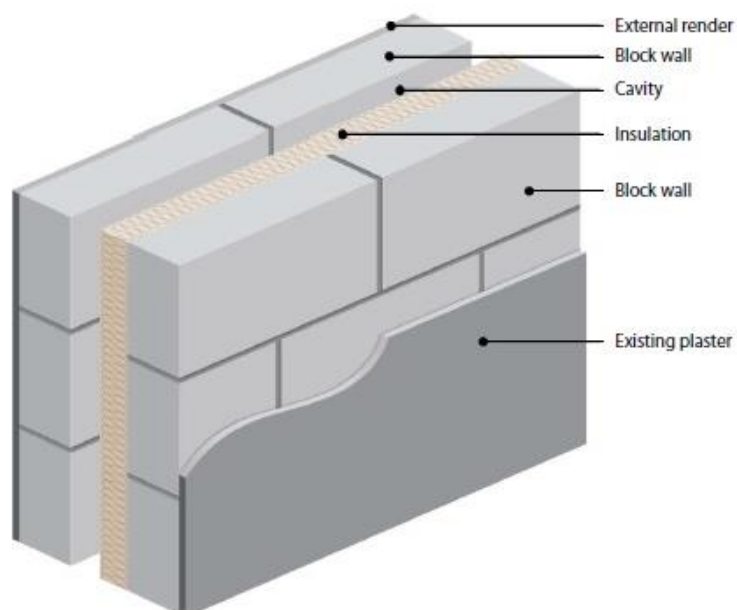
Schematic showing cavity wall (NSAI, 2014)
